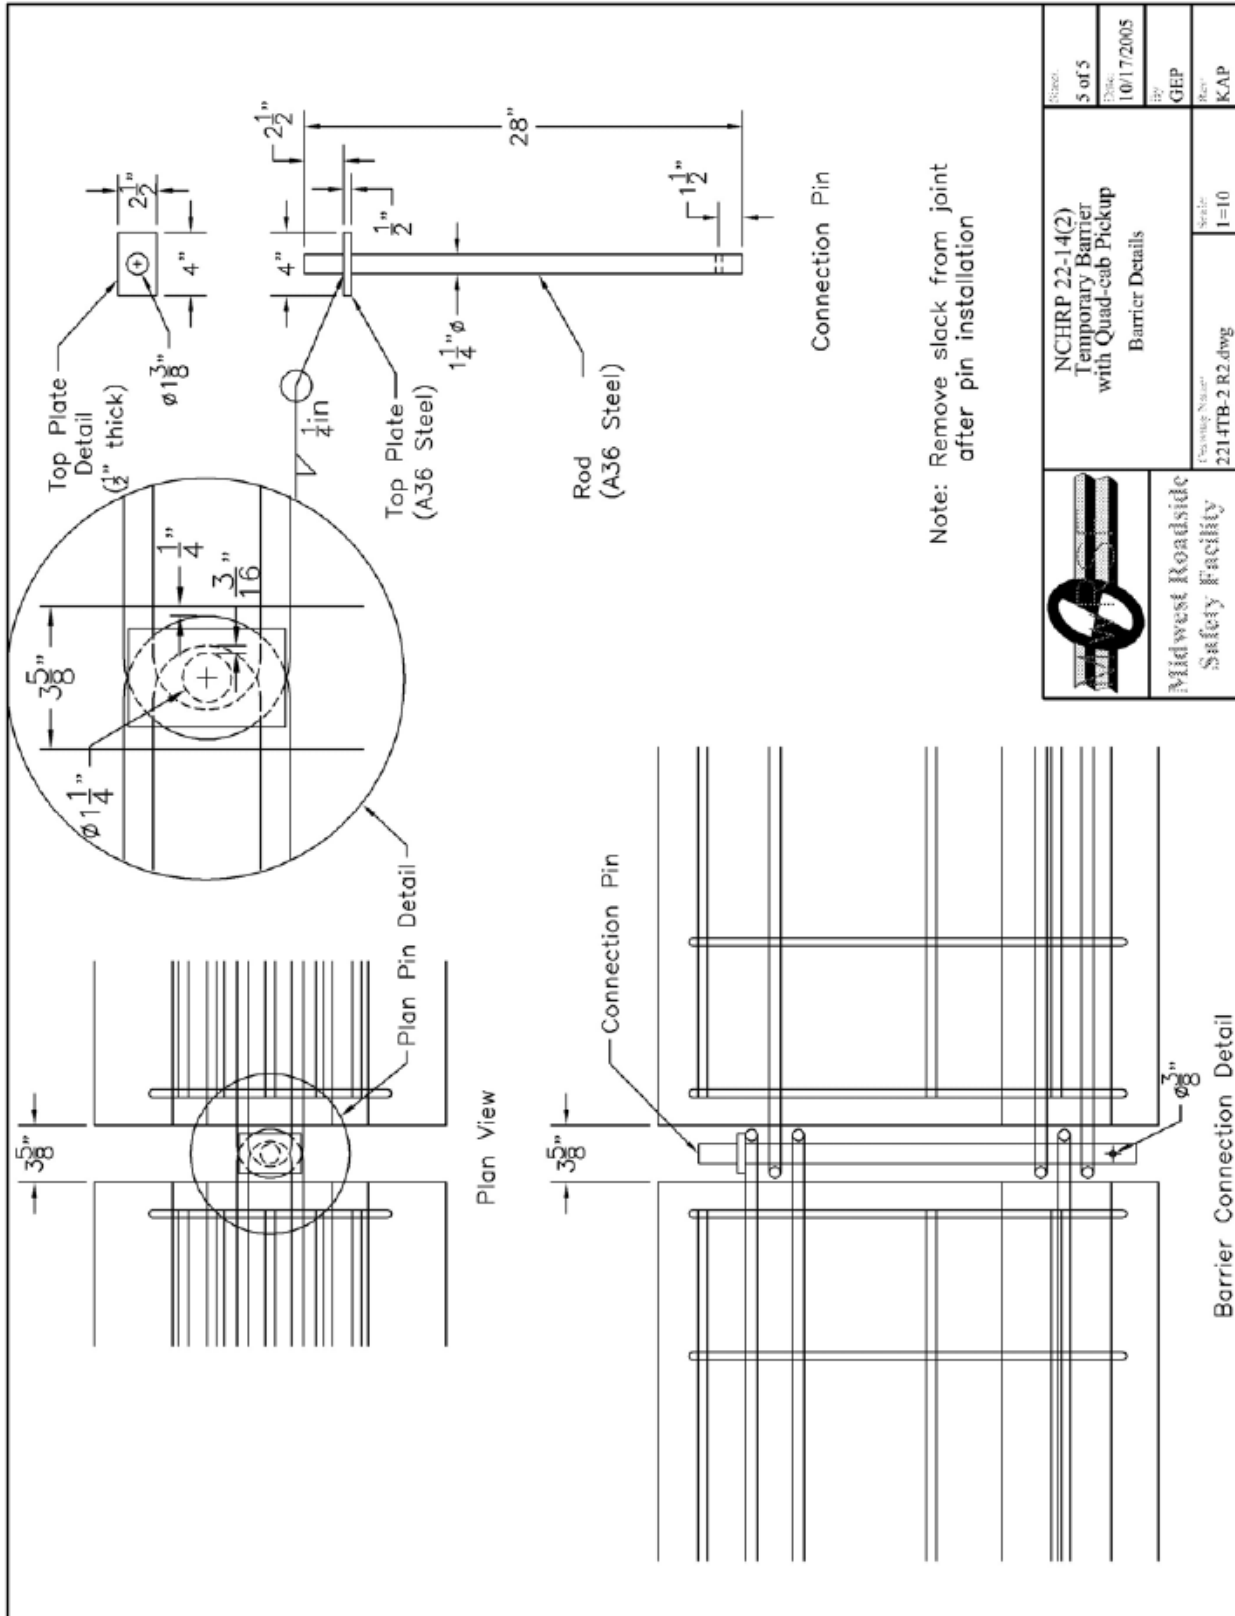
Details of F-Shape Barrier Tested to MASH TL-3 Cont.d.
